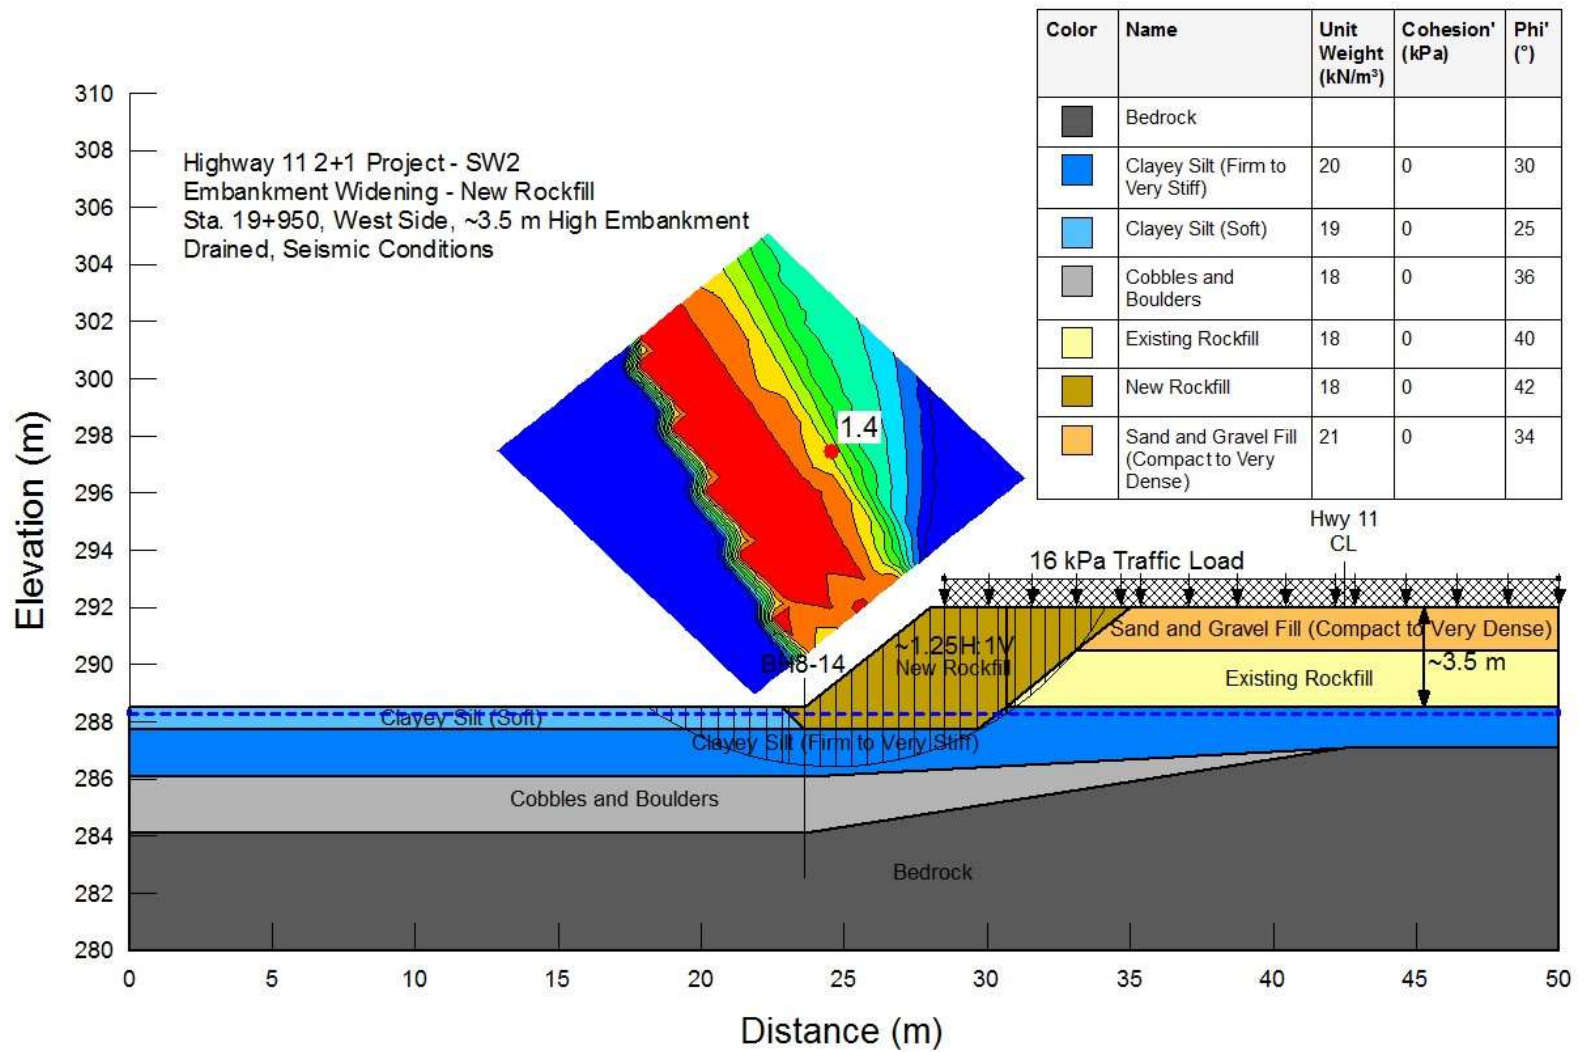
Slope stability analysis for embankment widening at Sta. 19+950, west side (~3.5 m high) – Rockfill (1.25H:1V) – drained, seismic condition
